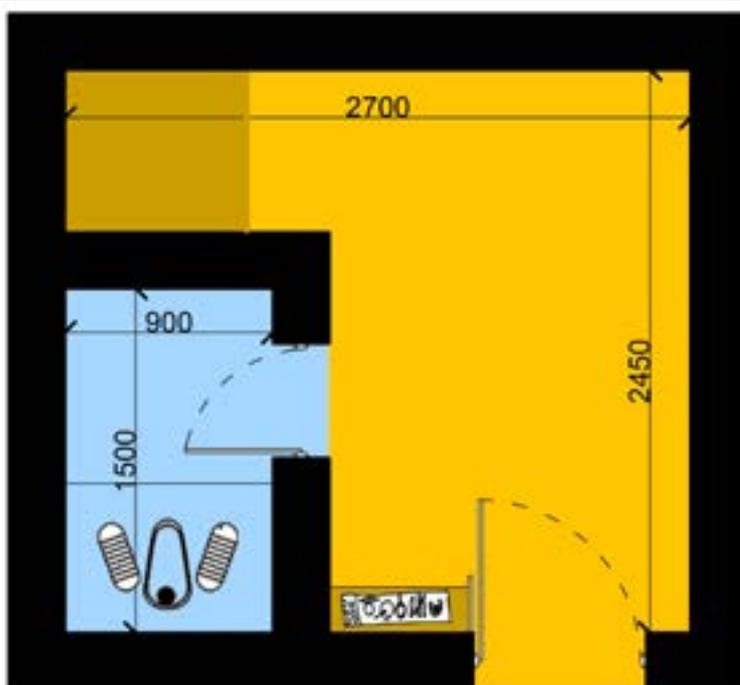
Plan of House No. 377, VijayNagar, Thane.
